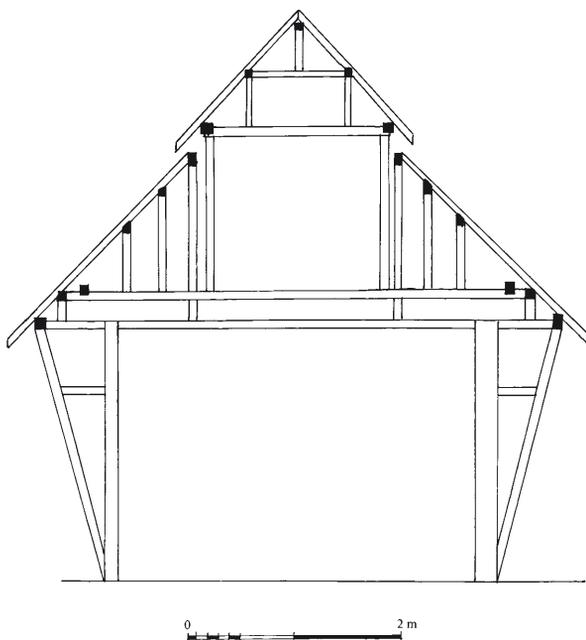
Fragment of a bending frame with two sides over a structure with warped walls at Luang Prabang in Laos.
